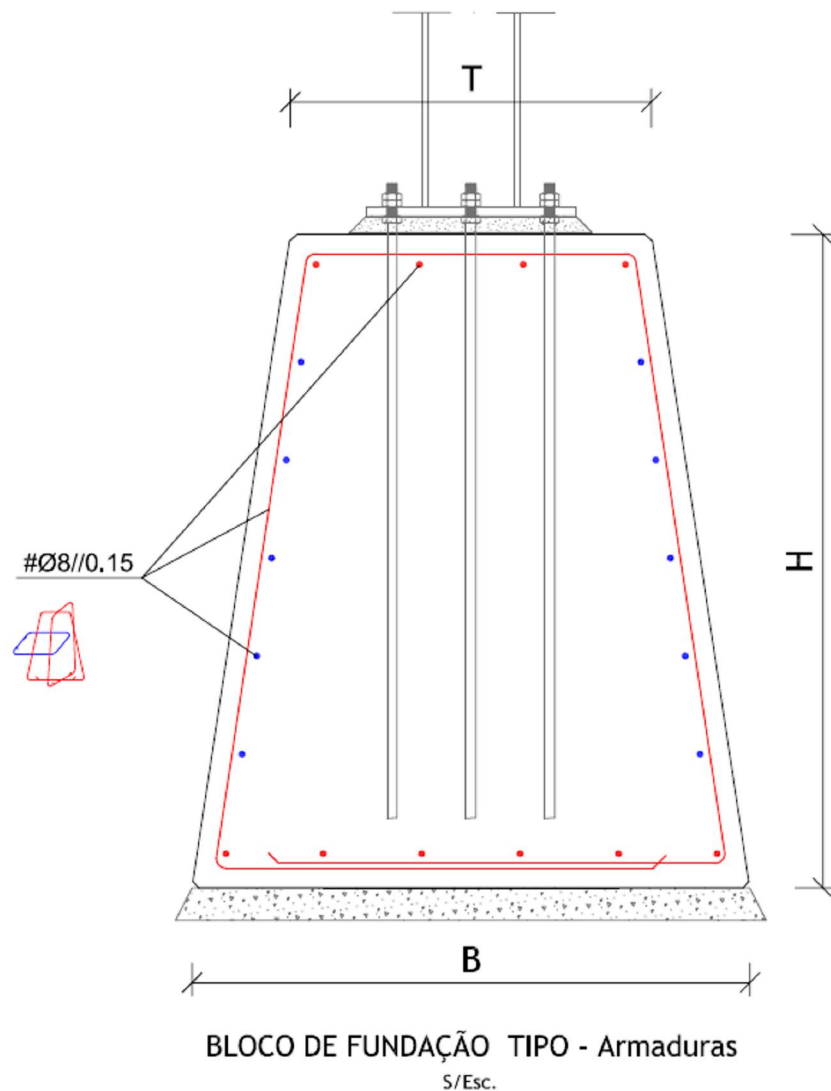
Typical foundation block . Armor layout (S/esc.)
